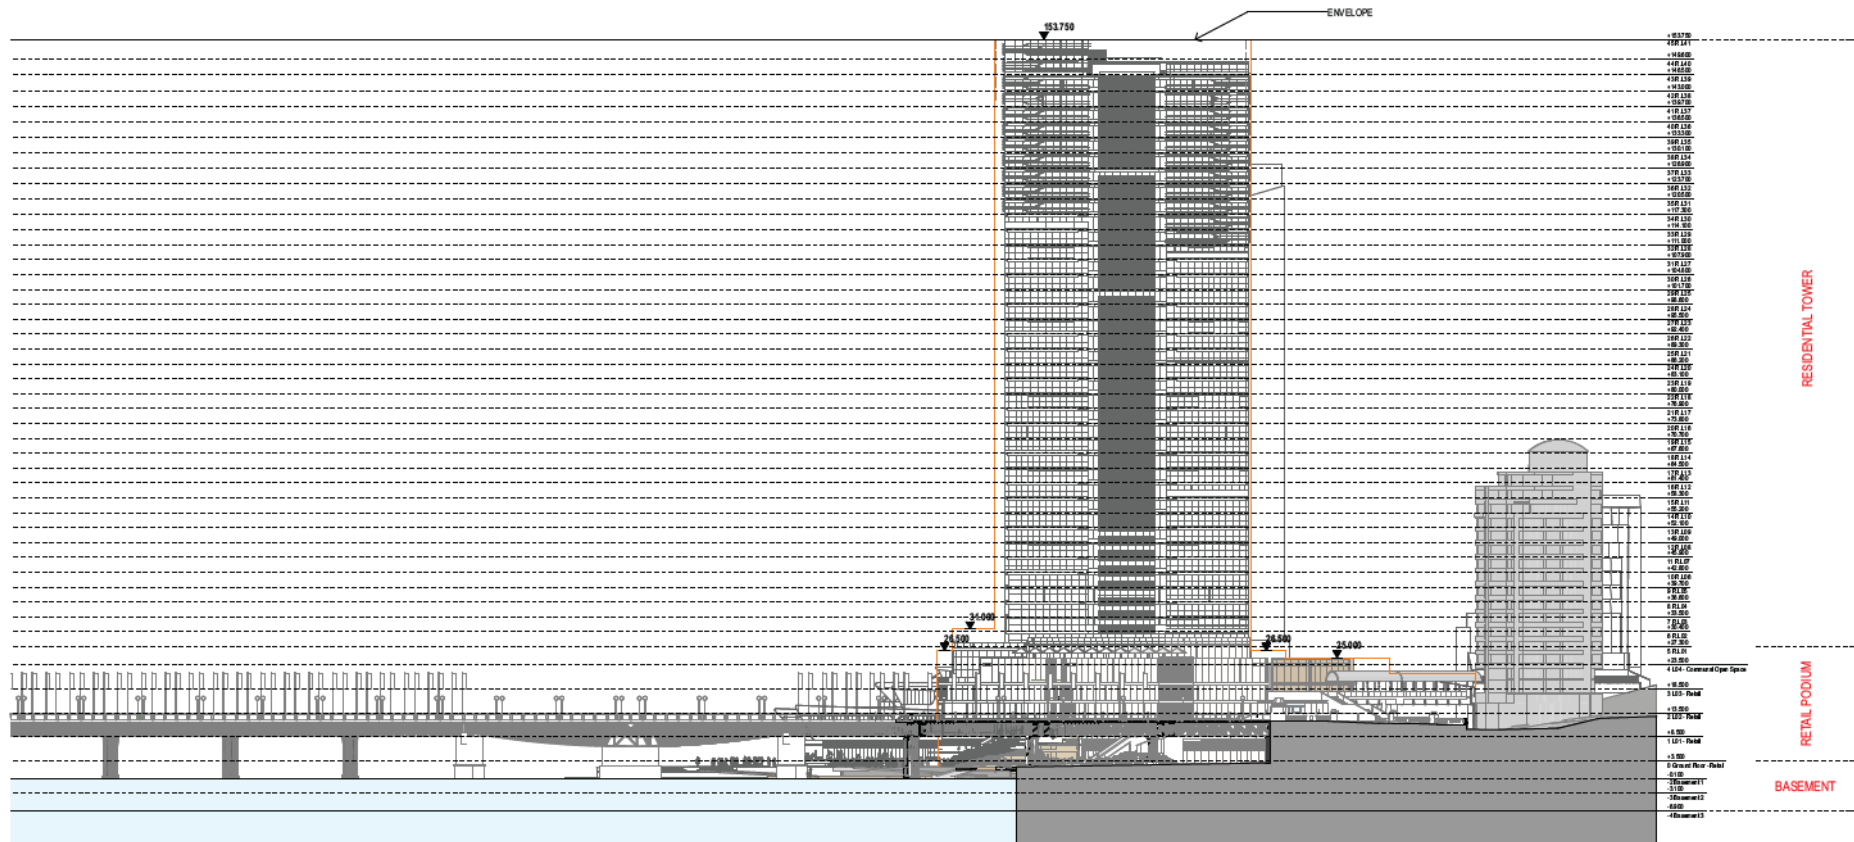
North Elevation – Indicative Elevation Only (Source: FJMT, 2020)
